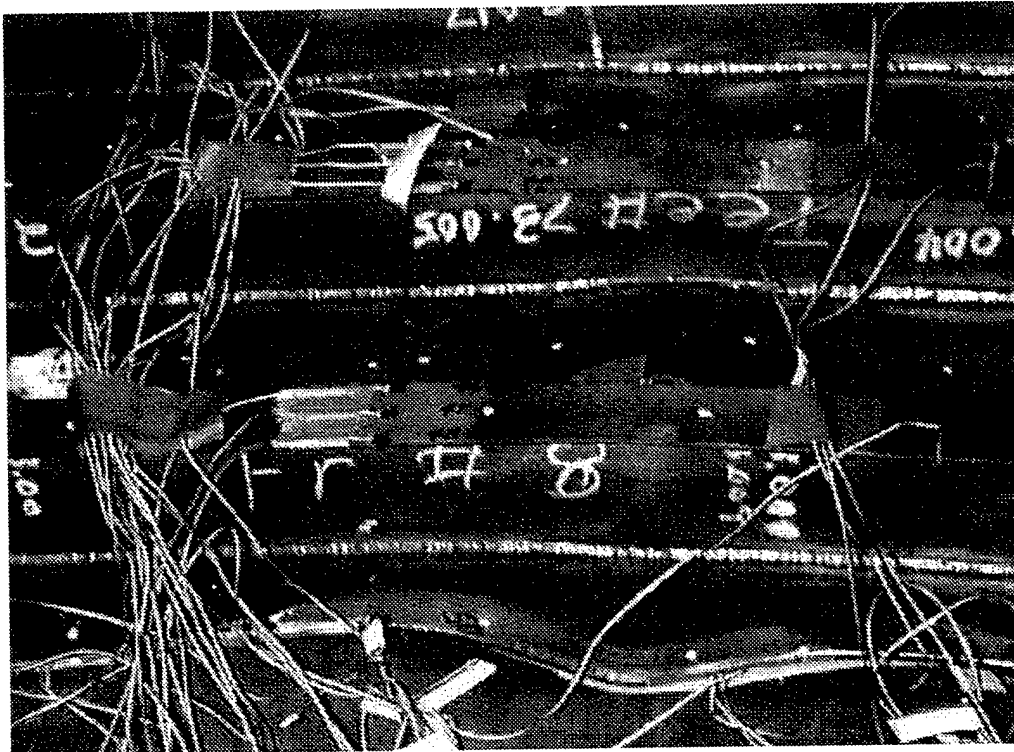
Detail of Plate and Stiffener Deformations on Grillage 0595
